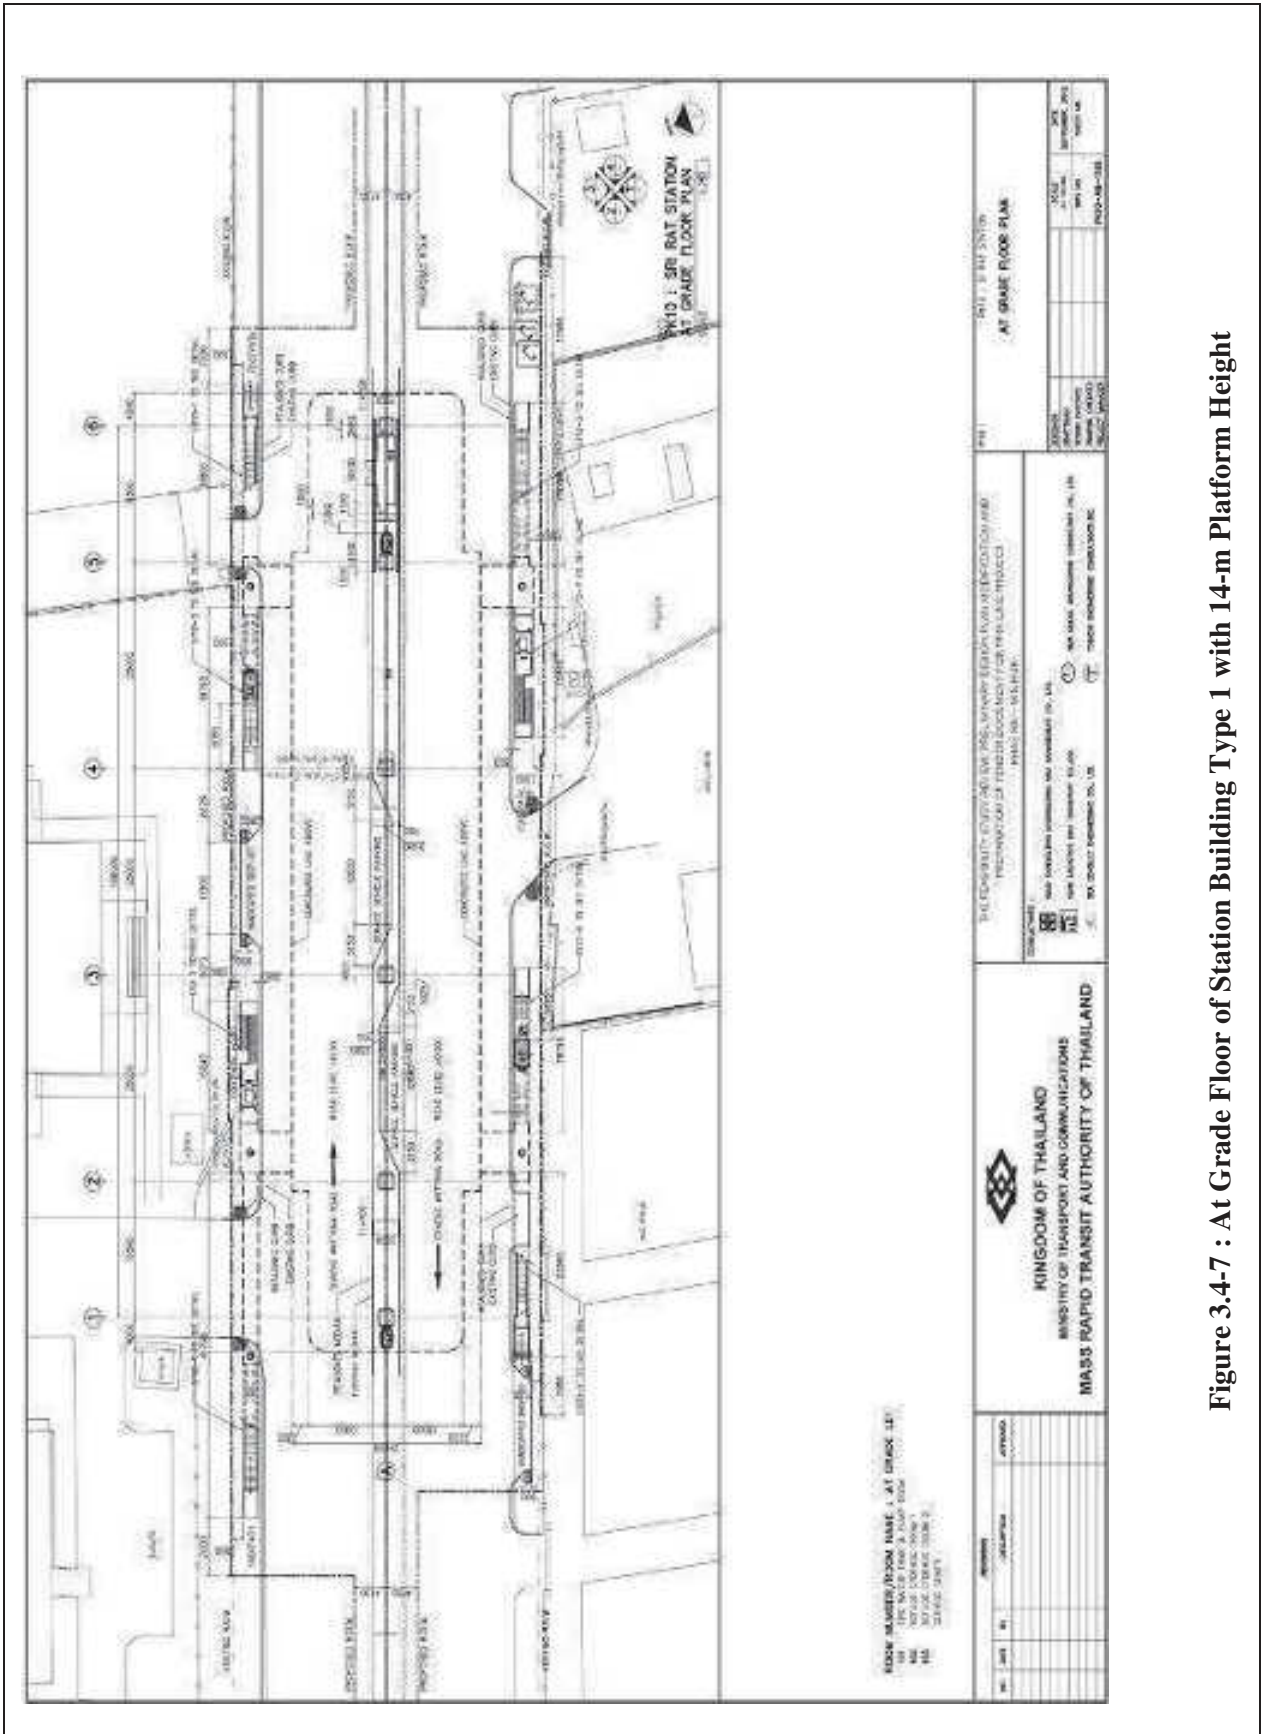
At Grade Floor of Station Building Type 1 with 14-m Platform Height
